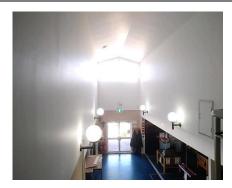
Result: Asbestos - Negative Location-Level: Interior - 2nd Floor Room-Location: All elevation of the floor - ceilings Feature-Material: Plaster-like material
